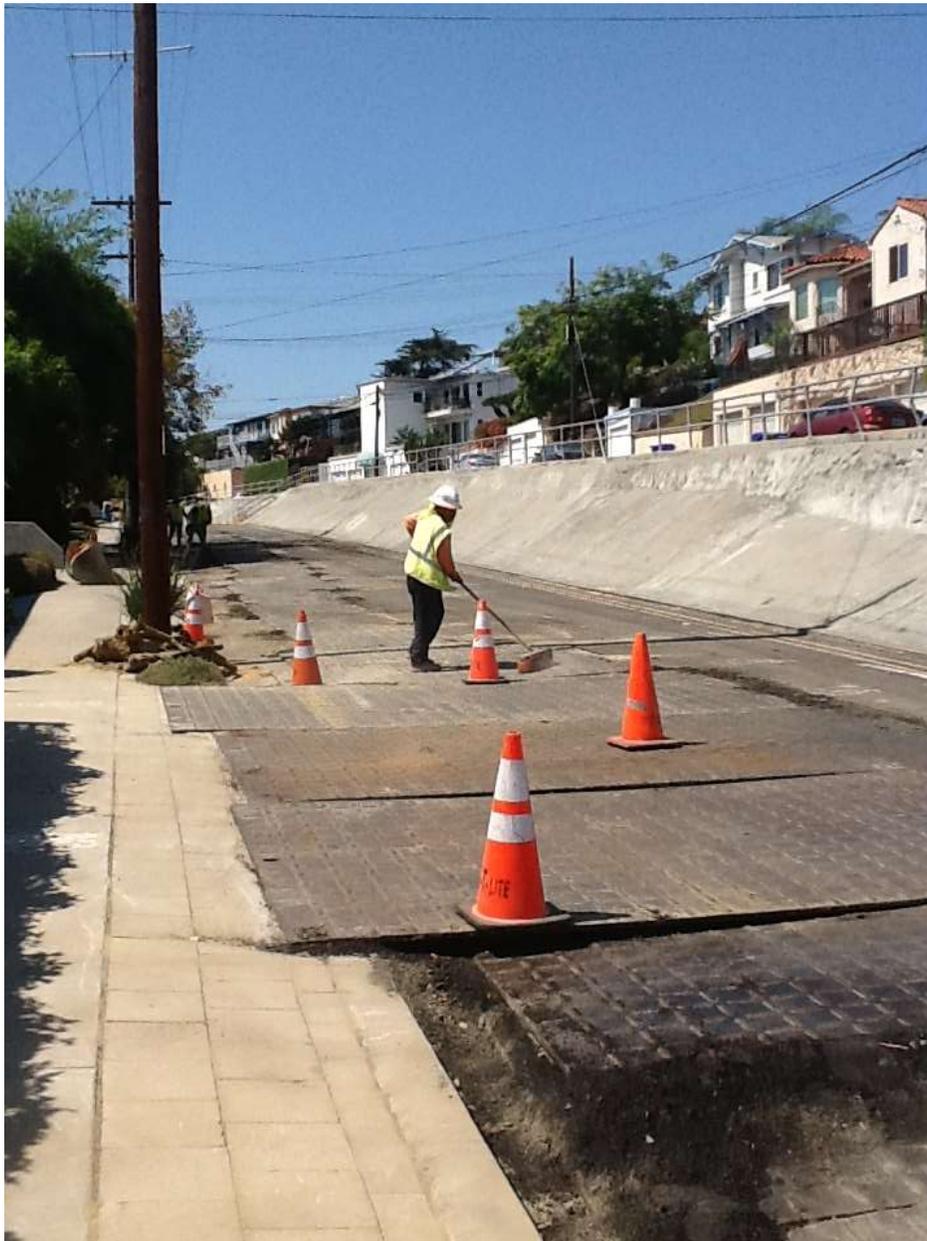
Steel plate placement over the trenchline at the end of the day along Columbia Street.
